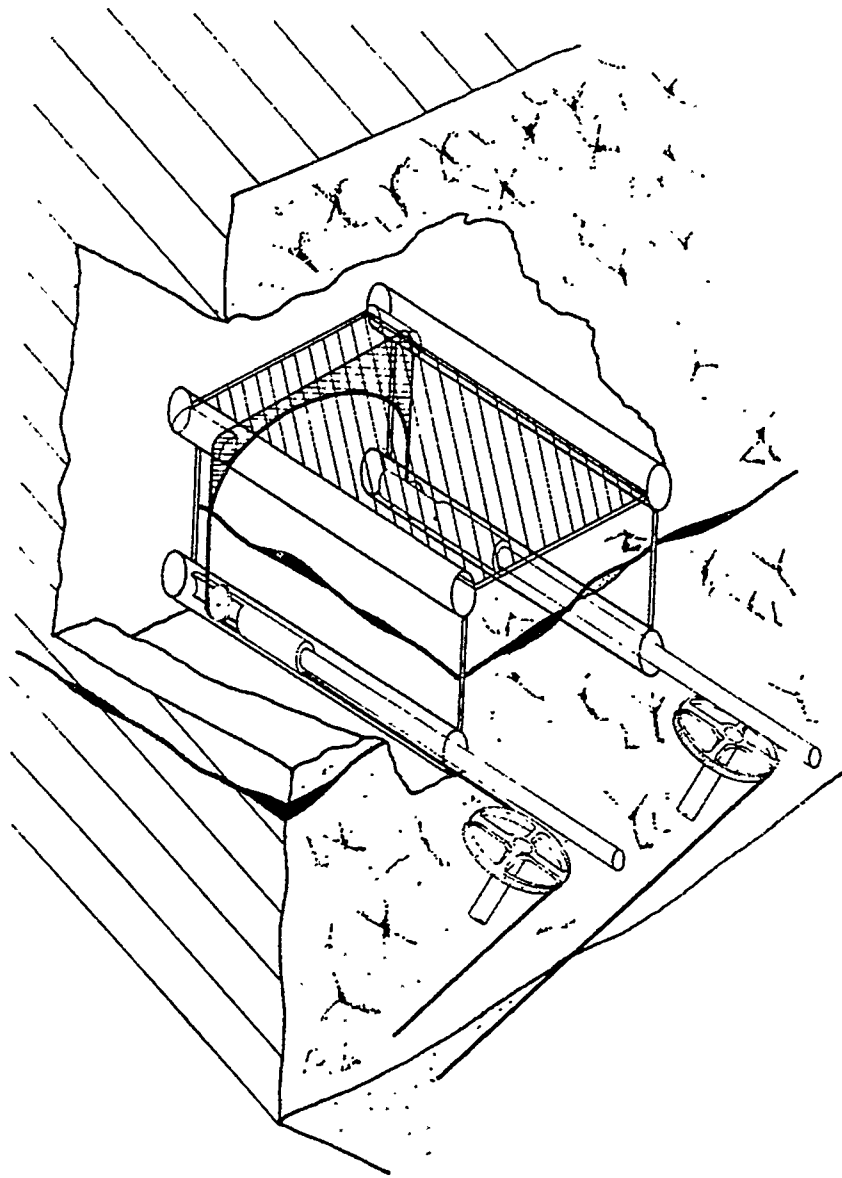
A method for extracting jointed blocks of rock from the walls or floor of a test adit, after Londe (1972).
